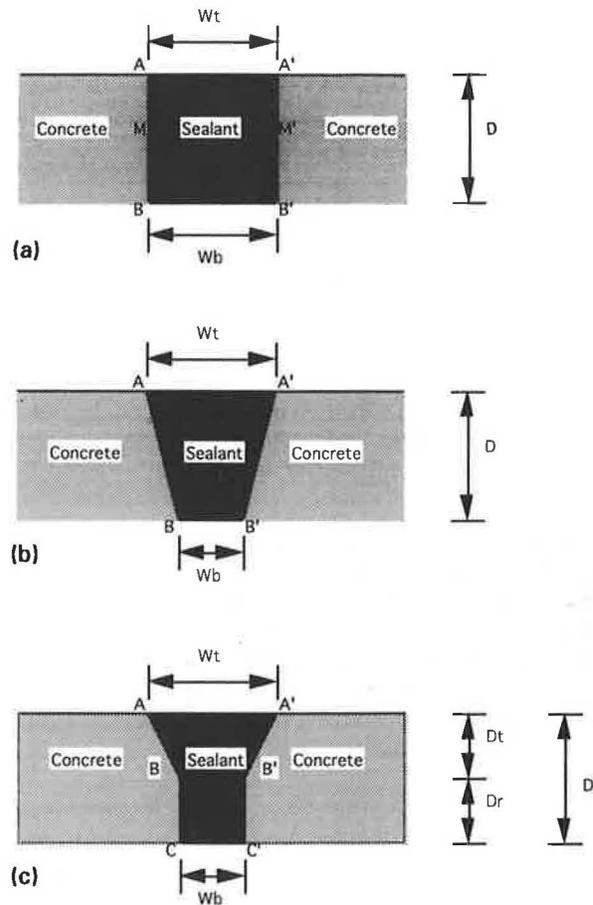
Cross sections: a, rectangular seal; b, trapezoidal seal; and c, trapezoidal-rectangular seal.
